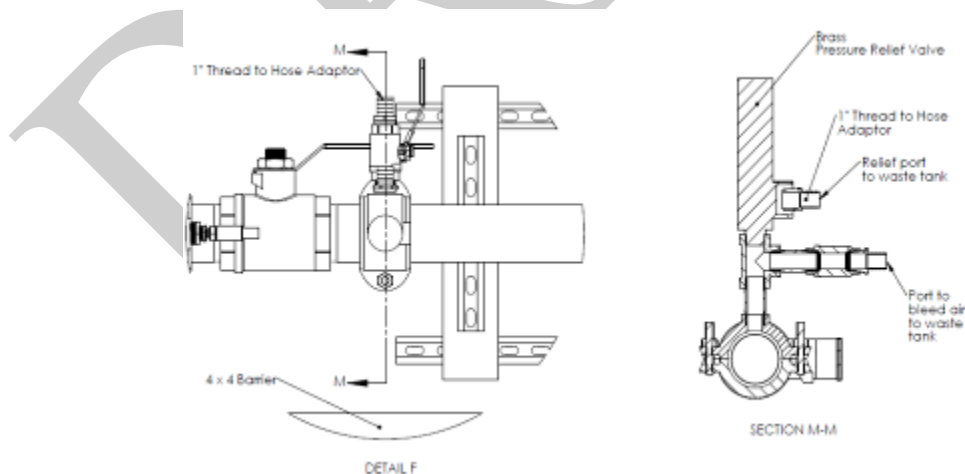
Detail views of the relief valve and ball valve used in the pipeline.
